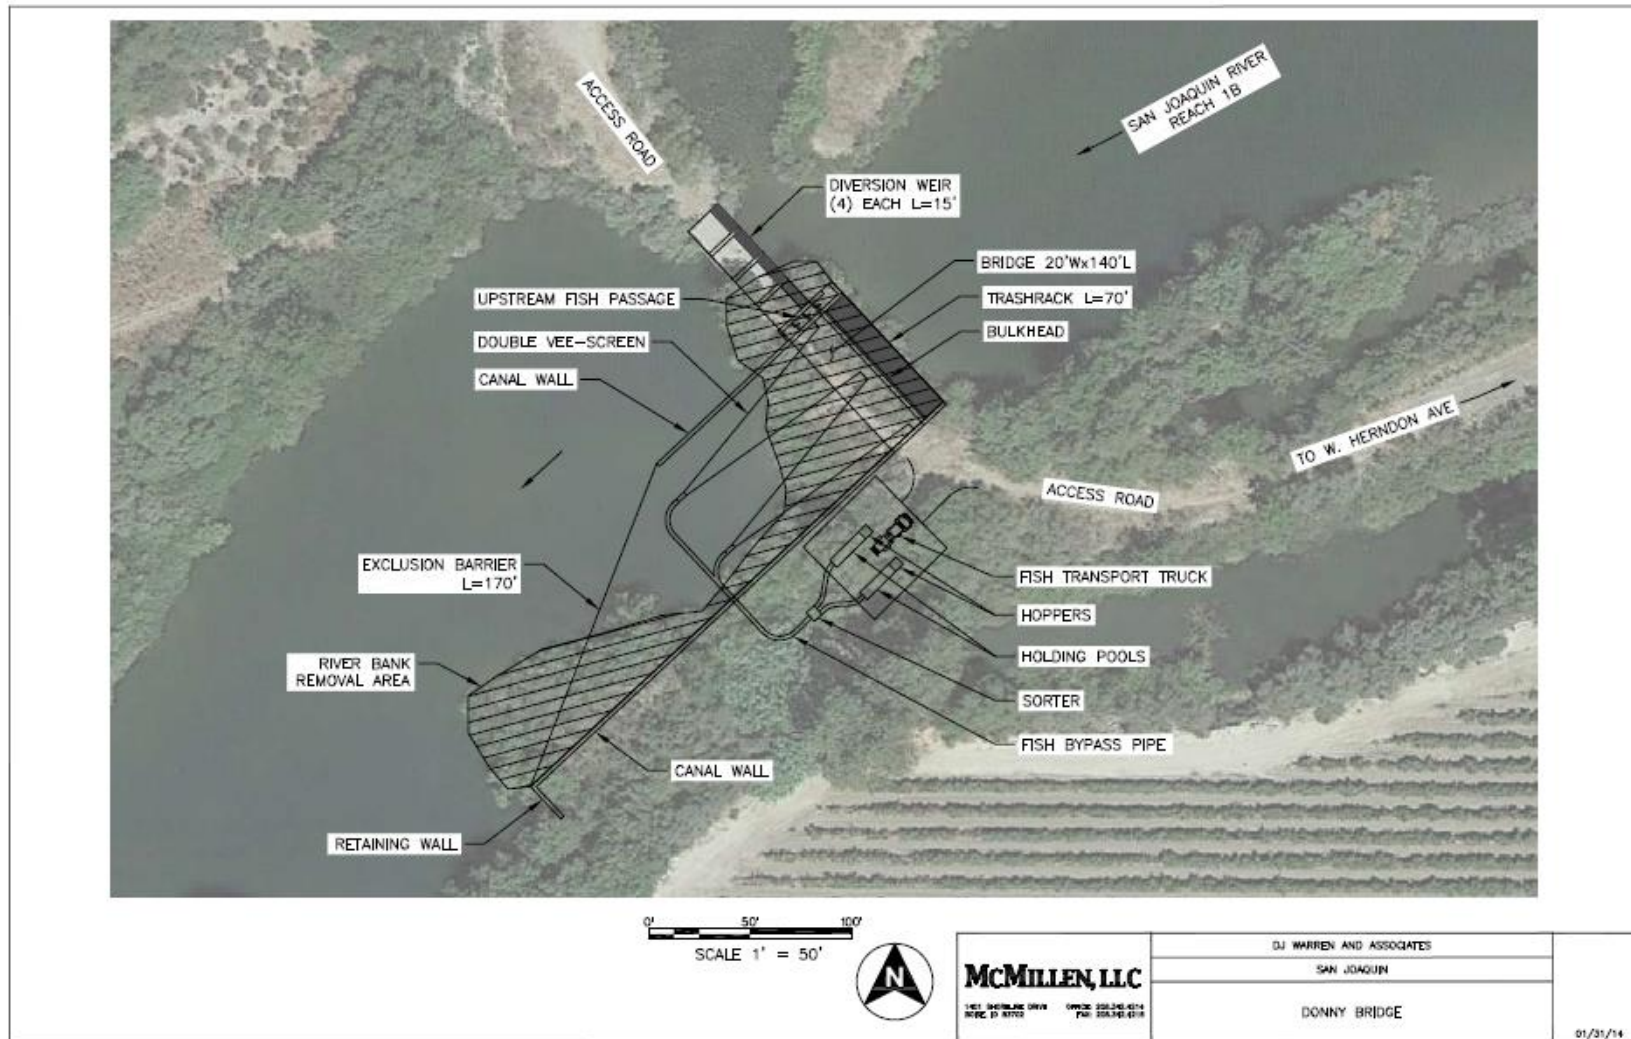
Alternative A: Conceptual design of Donny Bridge juvenile collection facility.
